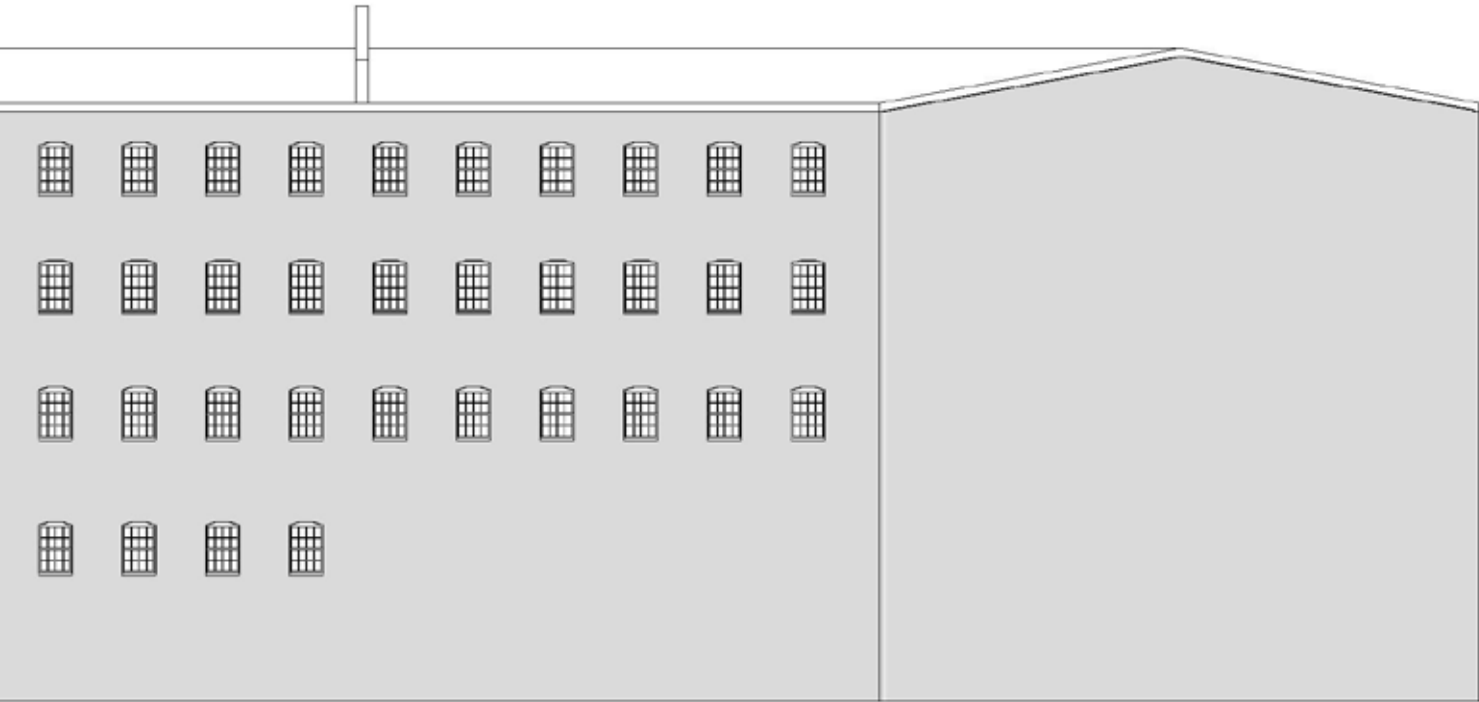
104 Anawan West Facade (Source: Morgan Warner)
